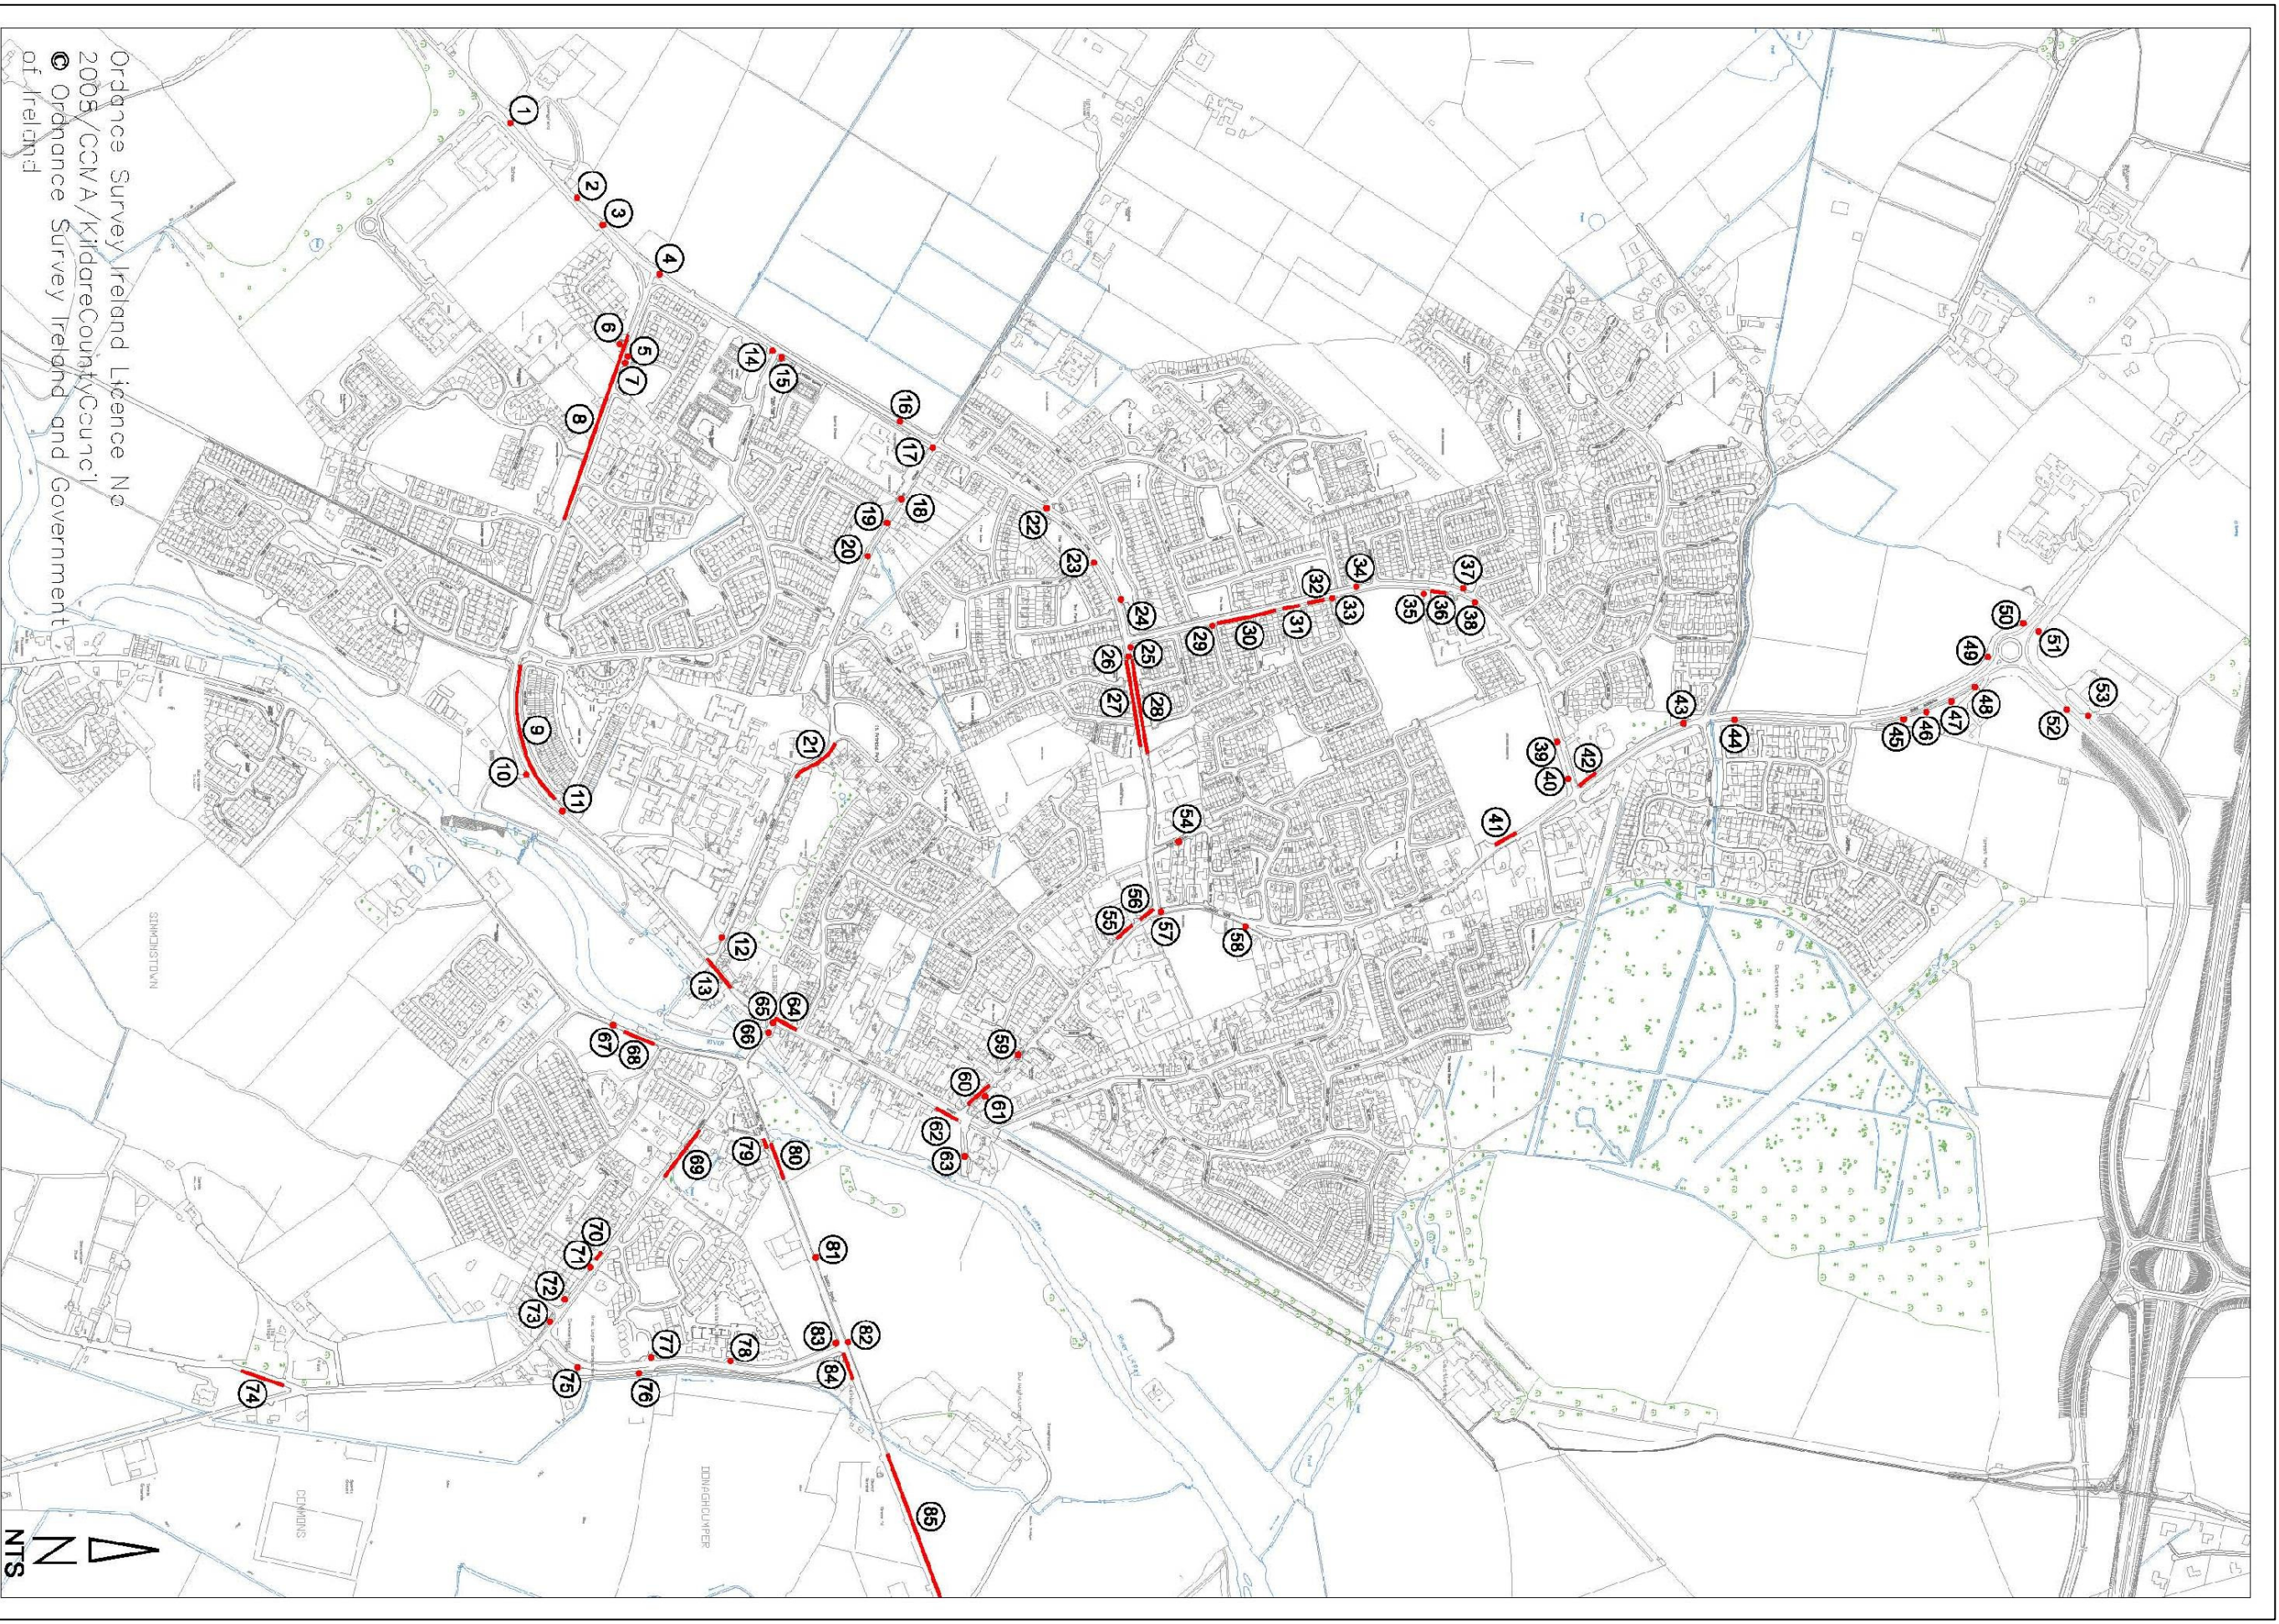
Minor improvements and Maintenance Recommendation, Location Plan, Celbridge
